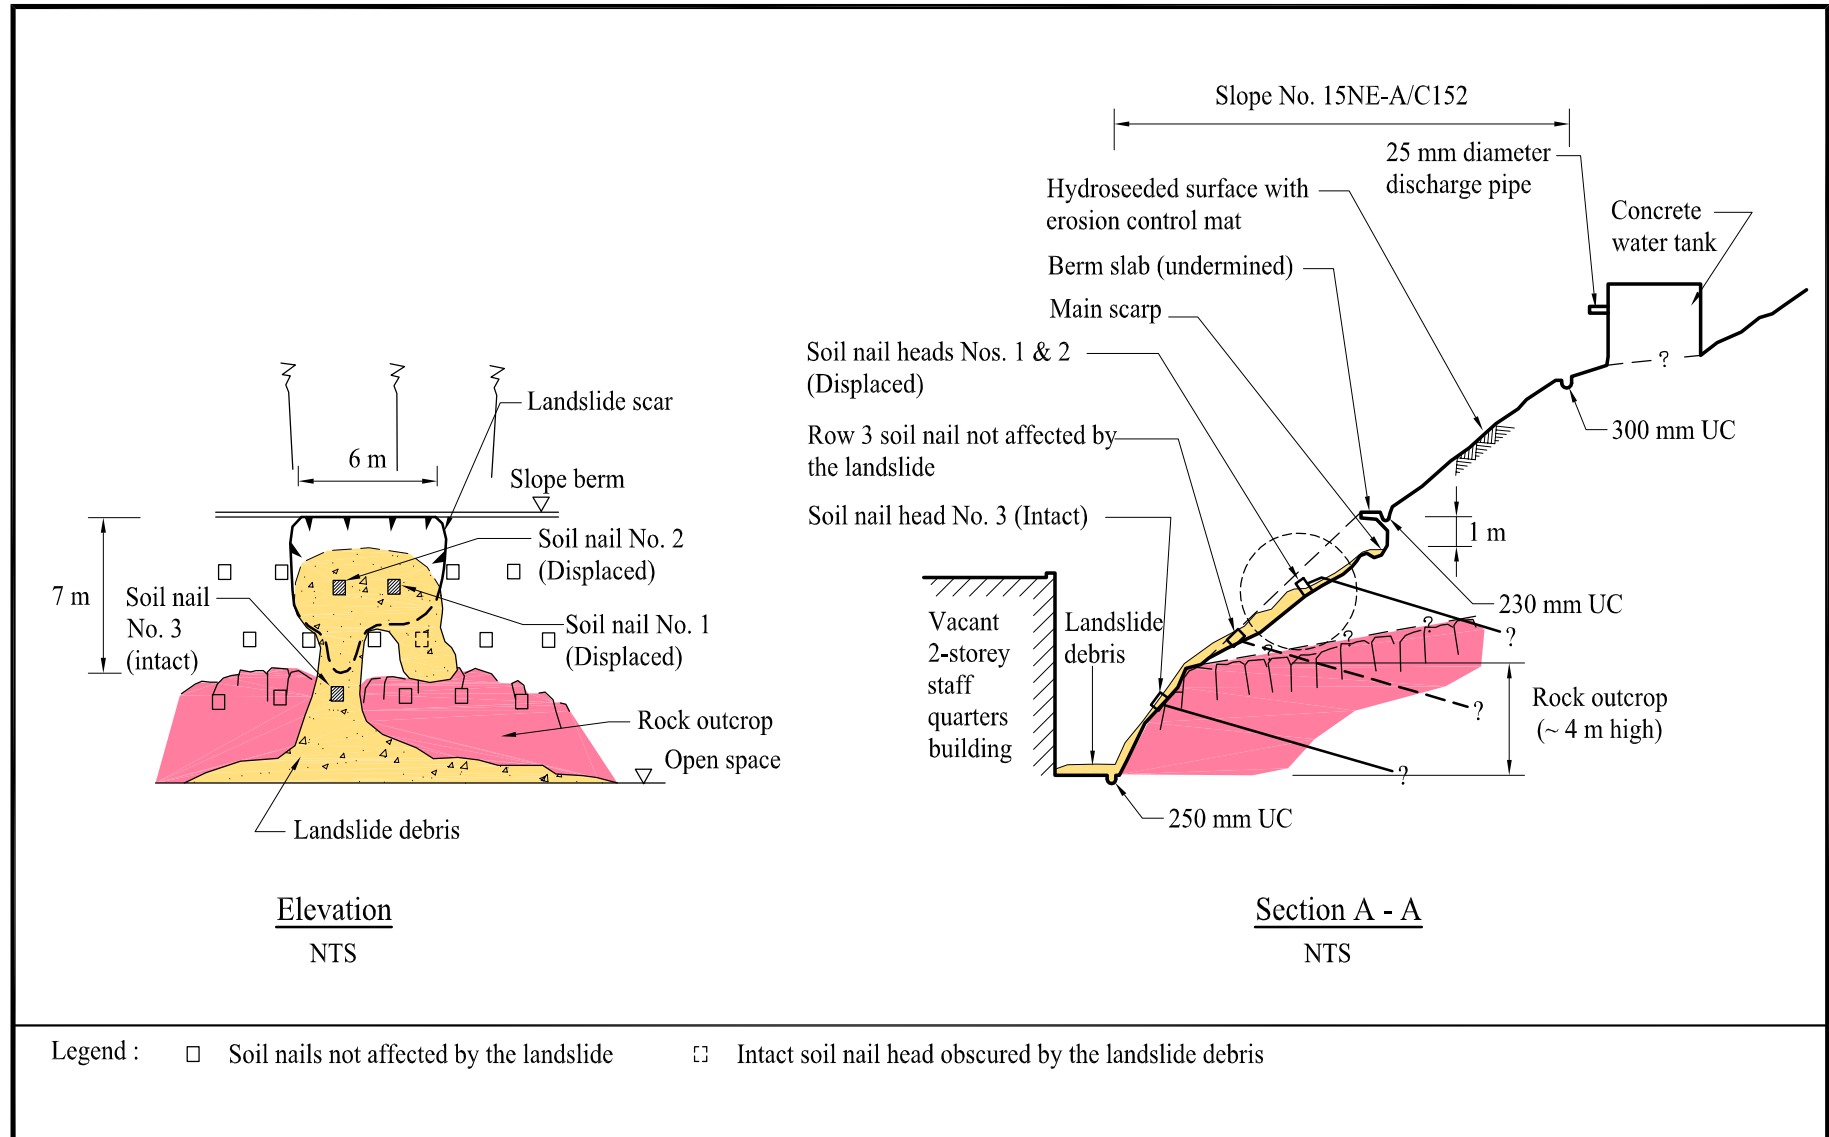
Section A - A and Elevation View (Slope No. 15NE-A/C152)
